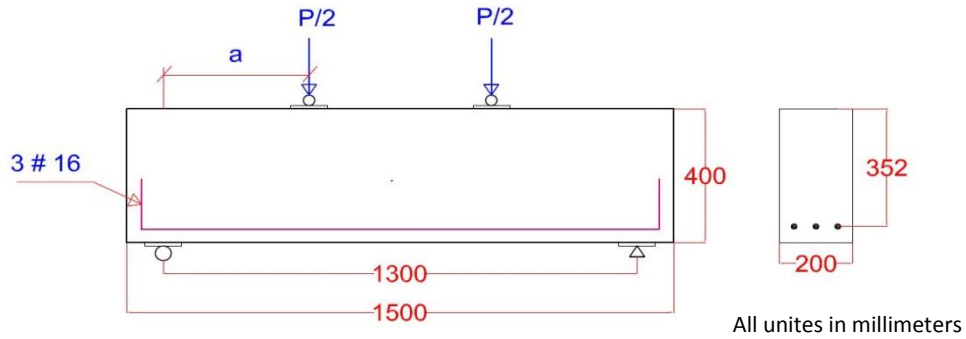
The Dimensions and Details of a Typical Specimen of RC Deep Beams
